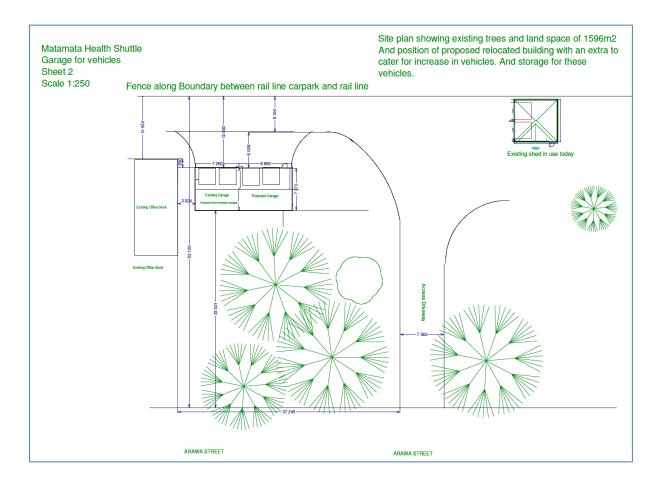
Plan showing proposed location of the new garage and the existing garage location
